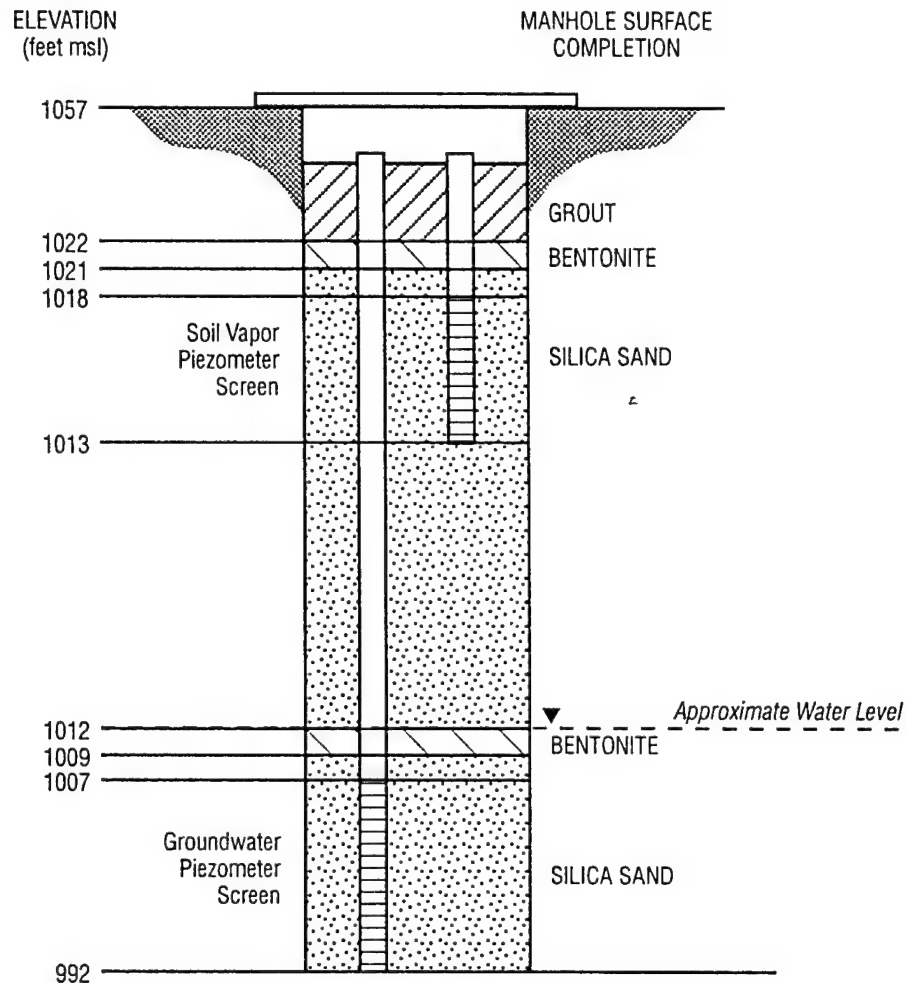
Building 301 LVDPE Pilot Test Site Cross Section
